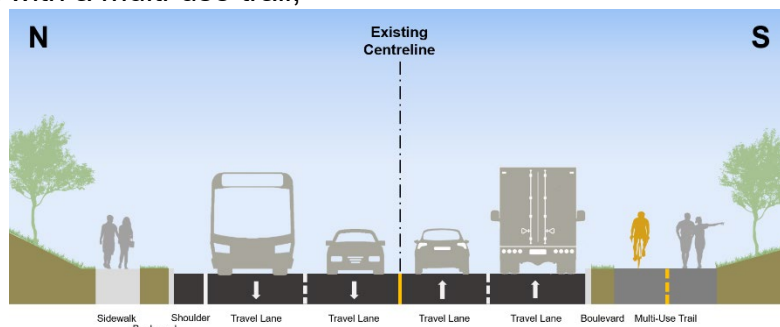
Illustration showing proposed lane, multi-use trail and sidewalk changes on Ellesmere Road between Orton Park Road and Military Trail facing west.
